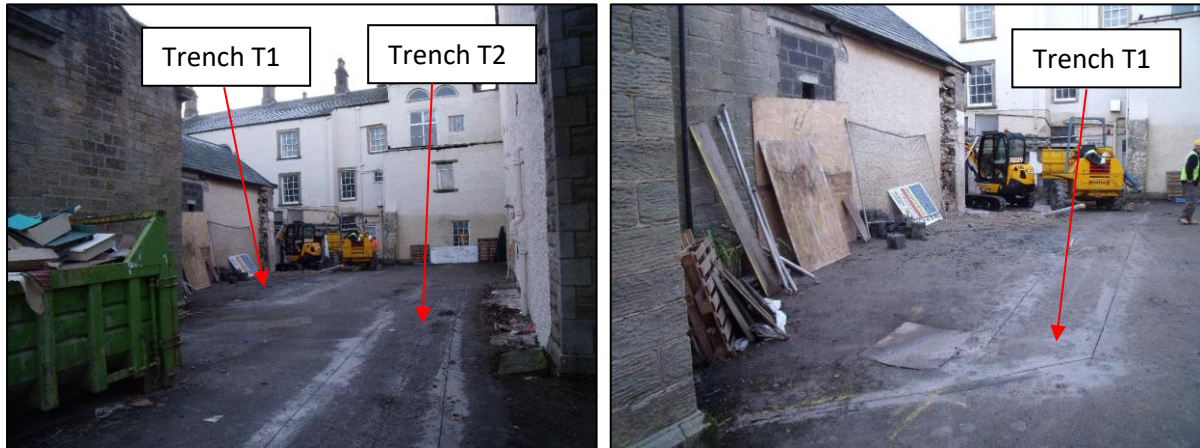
a, b (above). Both views looking south and with the west wall of the Grand Corridor to the left. Showing the location of the two trenches T1 and T2.
